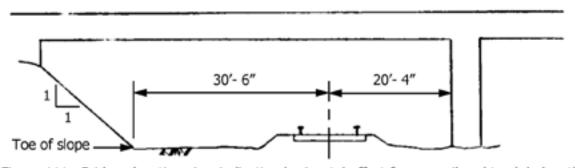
Bridge elevation view indicating horizontal offset for one railroad track below the bridge.
